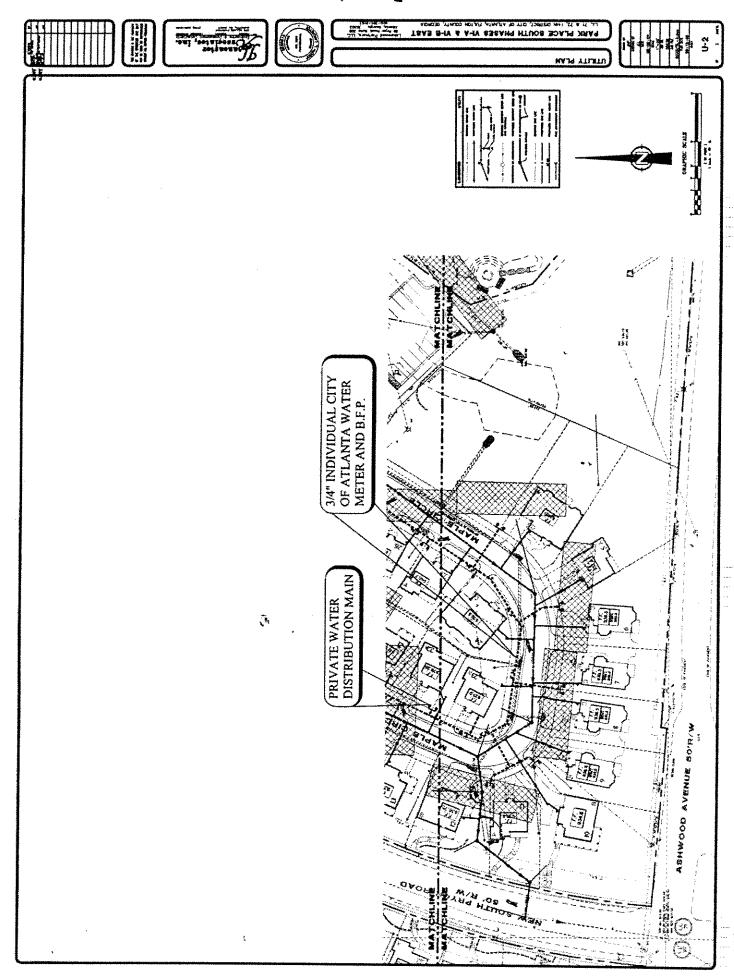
EXHIBIT A - UTILITY PLAN PARK PLACE SOUTH PHASE VI-B WEST
